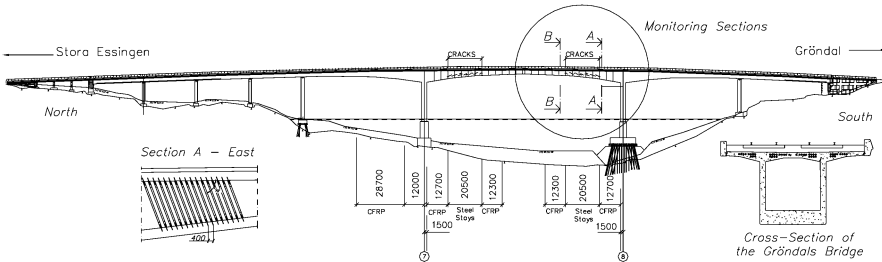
The Grøndals Bridge , CFRP strengthening and monitoring area
